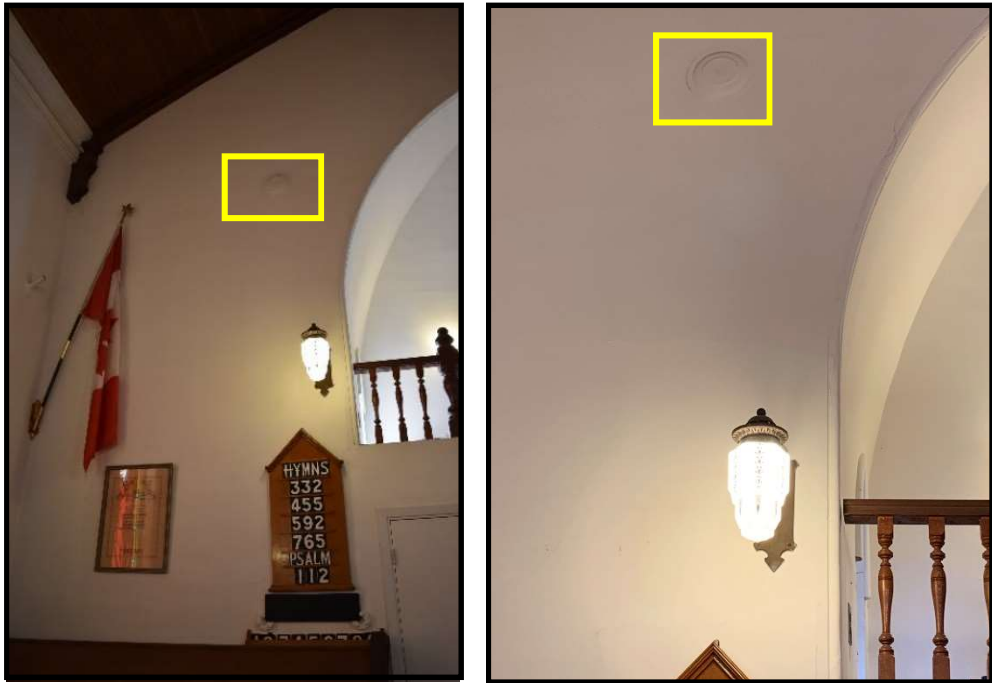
Wall plate covering hole where stove pipe would have fed through the wall, November 2019
